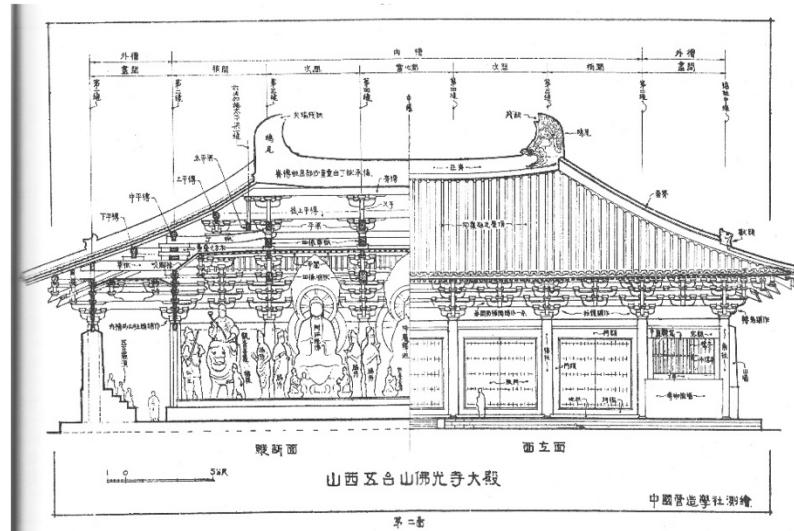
Liang Sicheng: Juxtapositional elevation and section of East Hall in Foguang Si (Liang, 1944).
